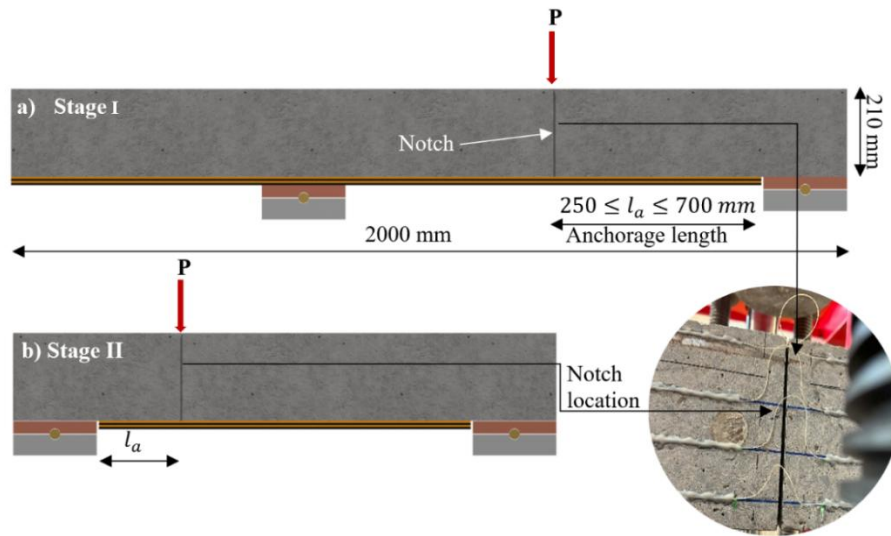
Sketch of experimental test stages with beam notch: a) Stage 1 with controlled anchorage length and overhang b) stage 2 with controlled anchorage only
